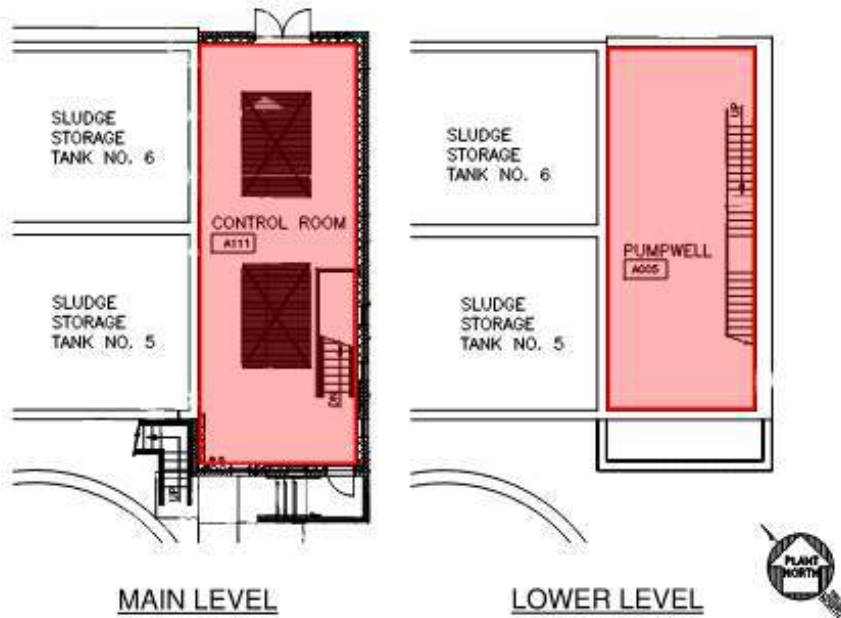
SSTs 5/6 Pump Building – Area Takeoff
